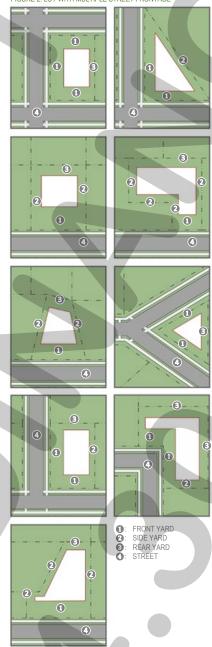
LOT WITH MULTIPLE STREET FRONTAGE
